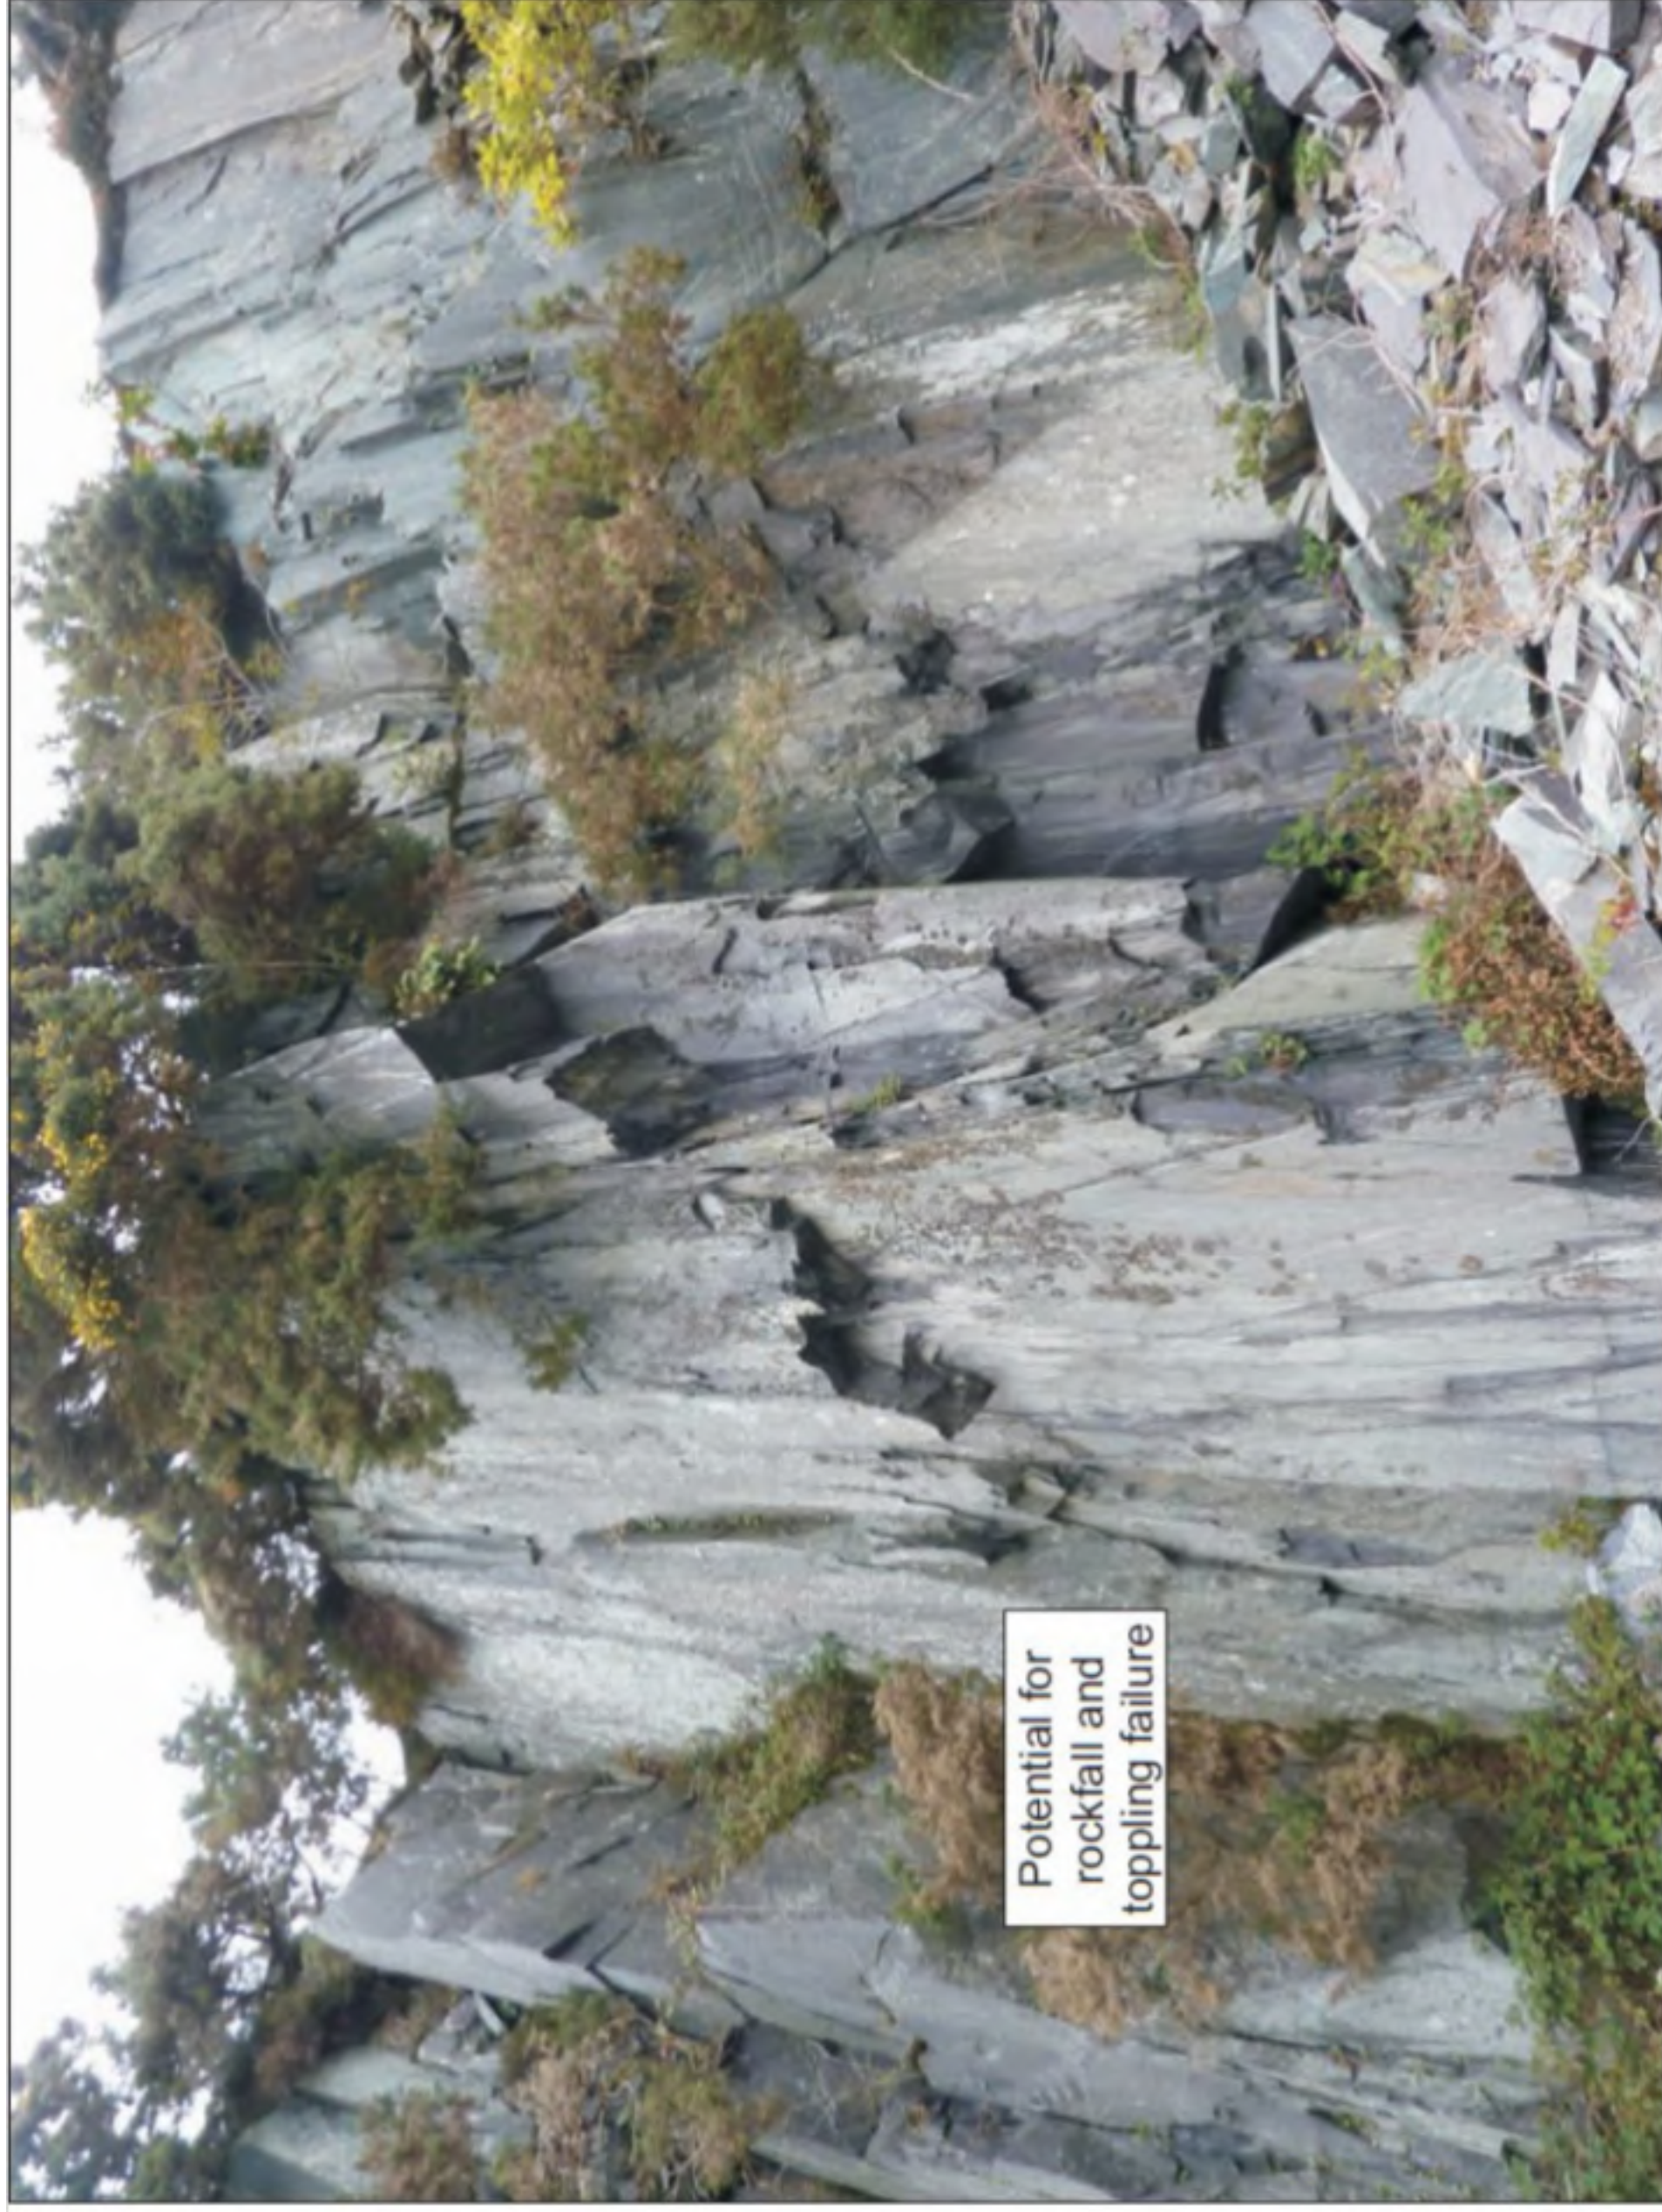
View of rockmass between the two quarry excavations, view looking south
